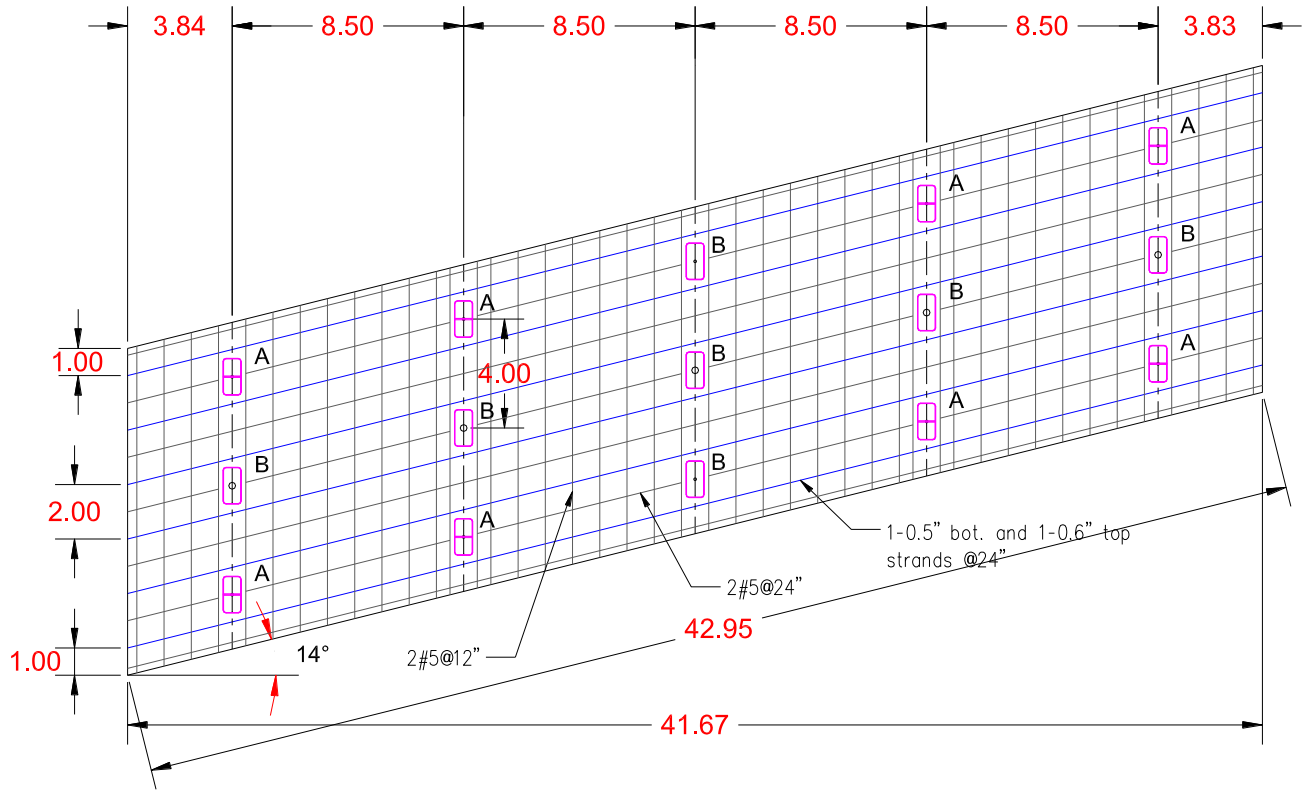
Typical precast concrete deck panel and its connection to concrete girder
